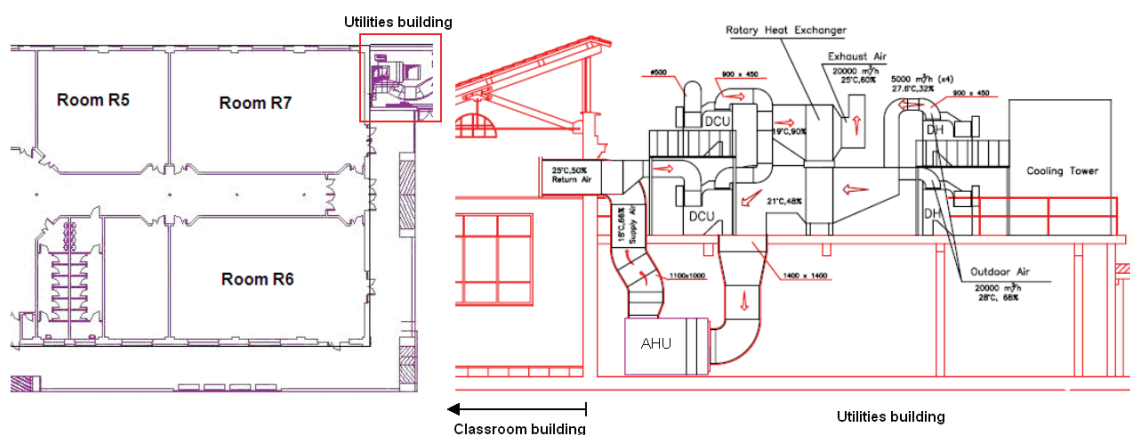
Utilities building containing the desiccant units placed next to the classroom building
